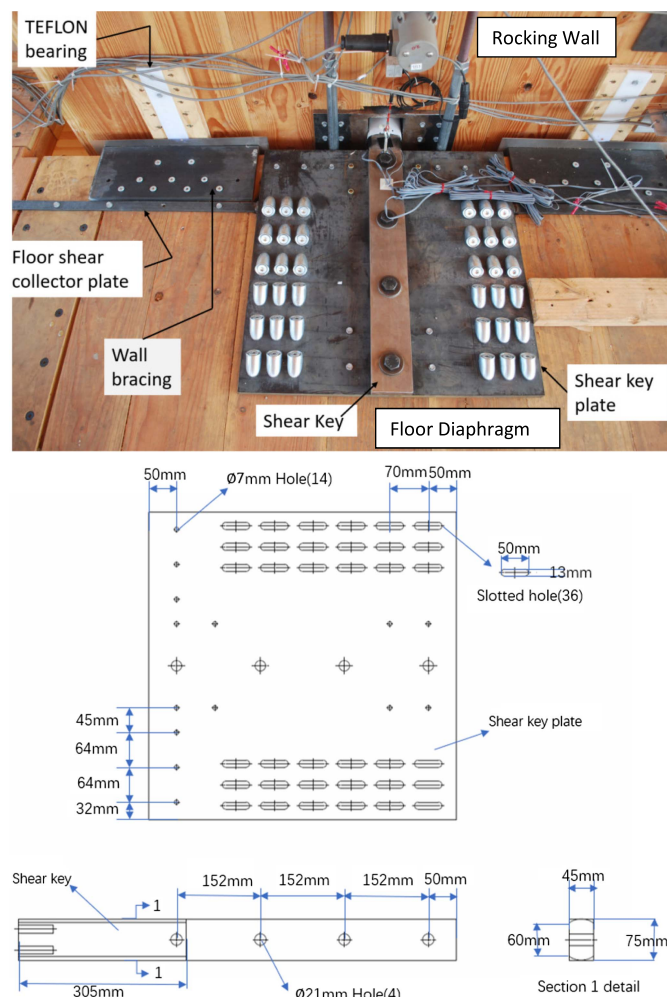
Shear key connection details between rocking wall and floor diaphragm.
